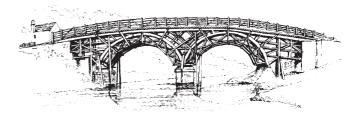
Sketch of the wooden Preen's Eddy (Coalport) Bridge c 1789 by J Farington.
